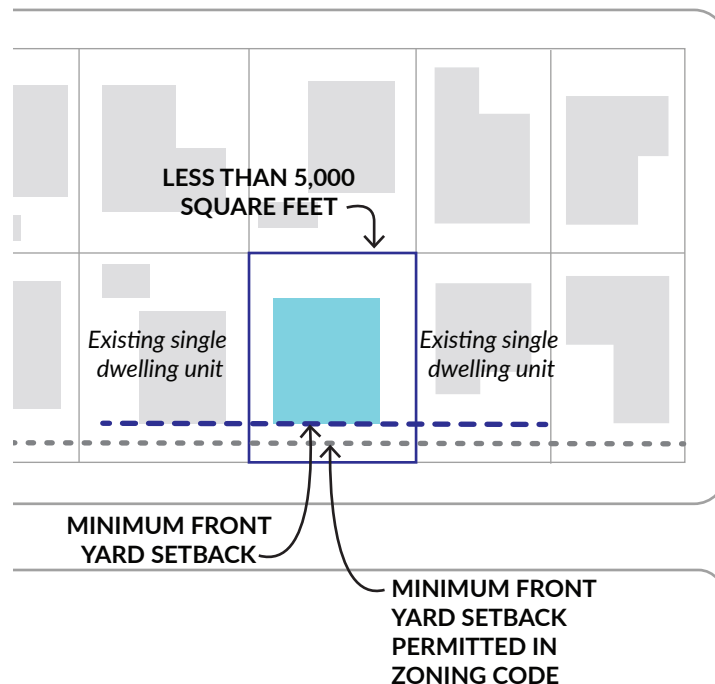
Front yard setbacks adjacent to single dwelling units, for parcels less than 5,000 square feet.
